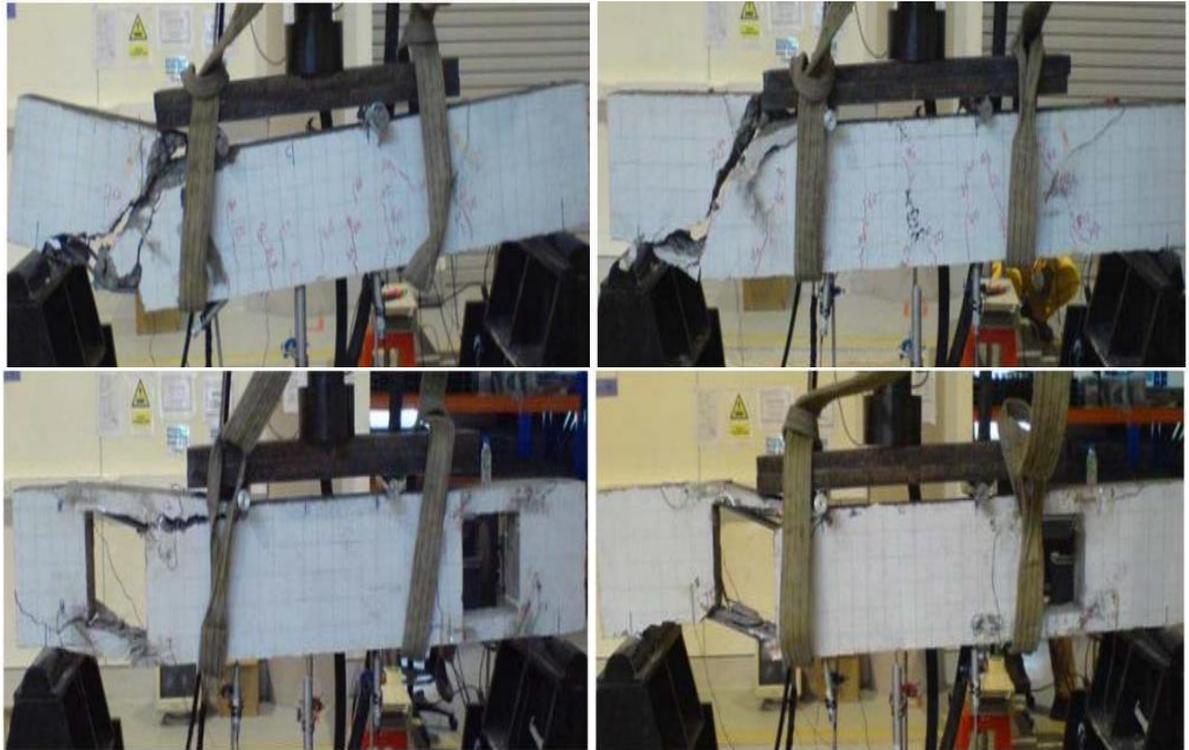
Cracks pattern and failure mode of control beam and un-strengthened beams with rectangular openings
